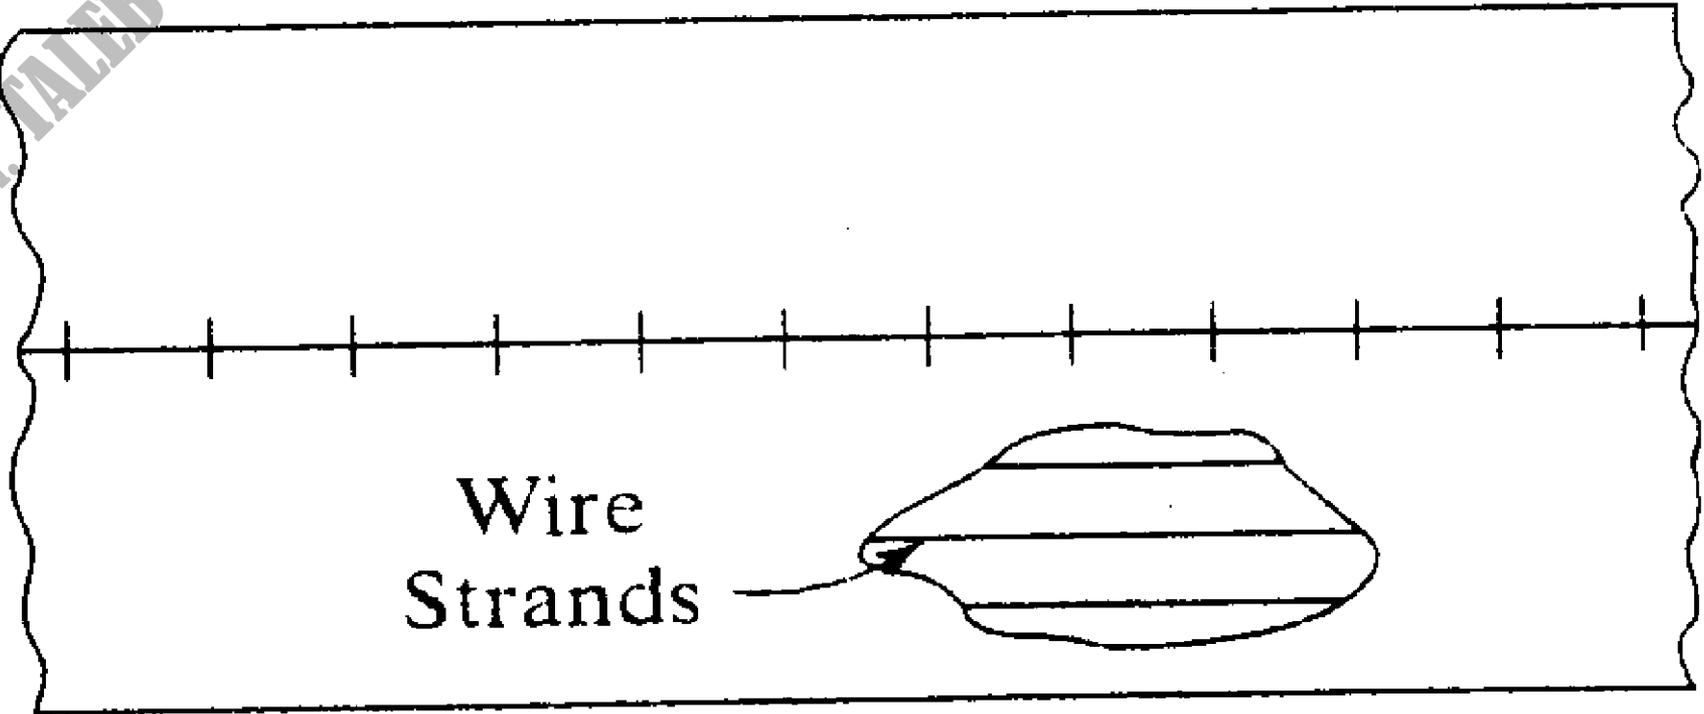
Continuously Reinforced Concrete Pavement (CRCP)
